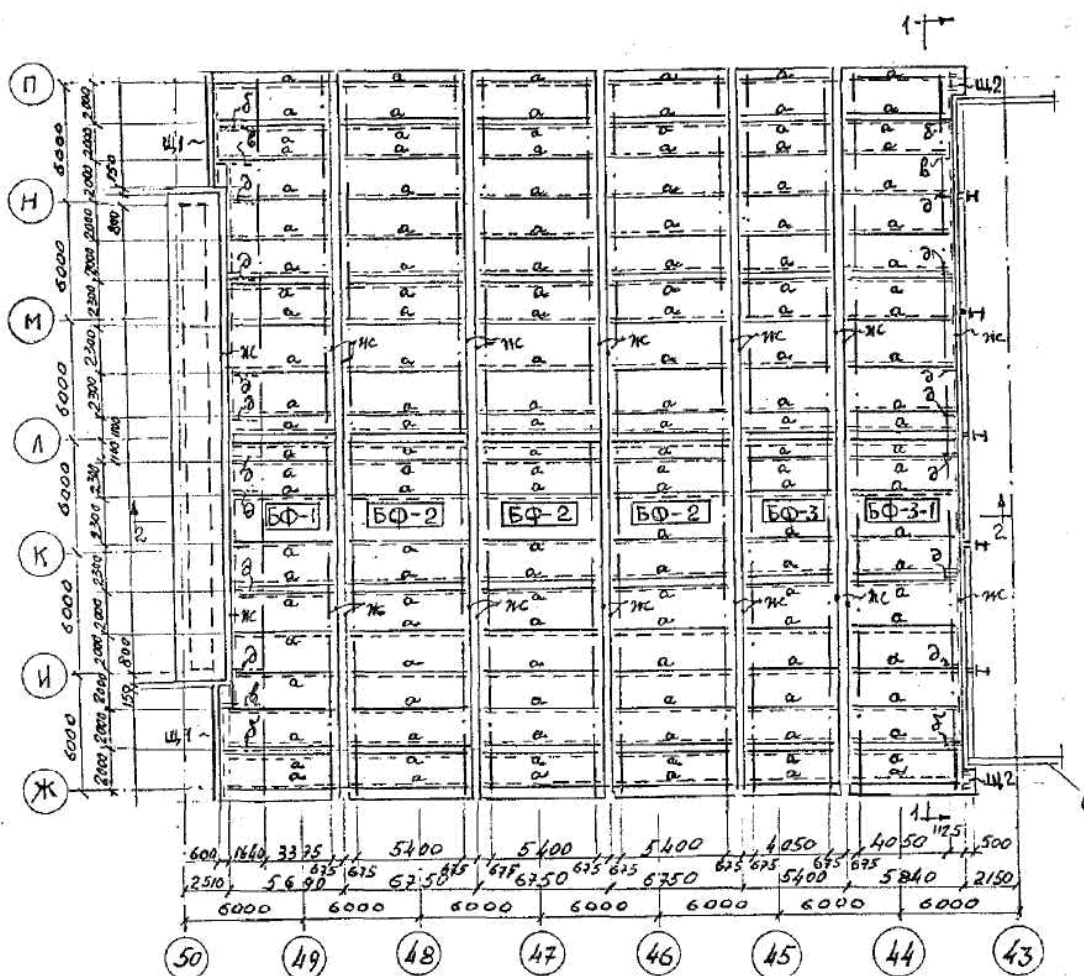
Metal structures of pipe rolling and light roof
